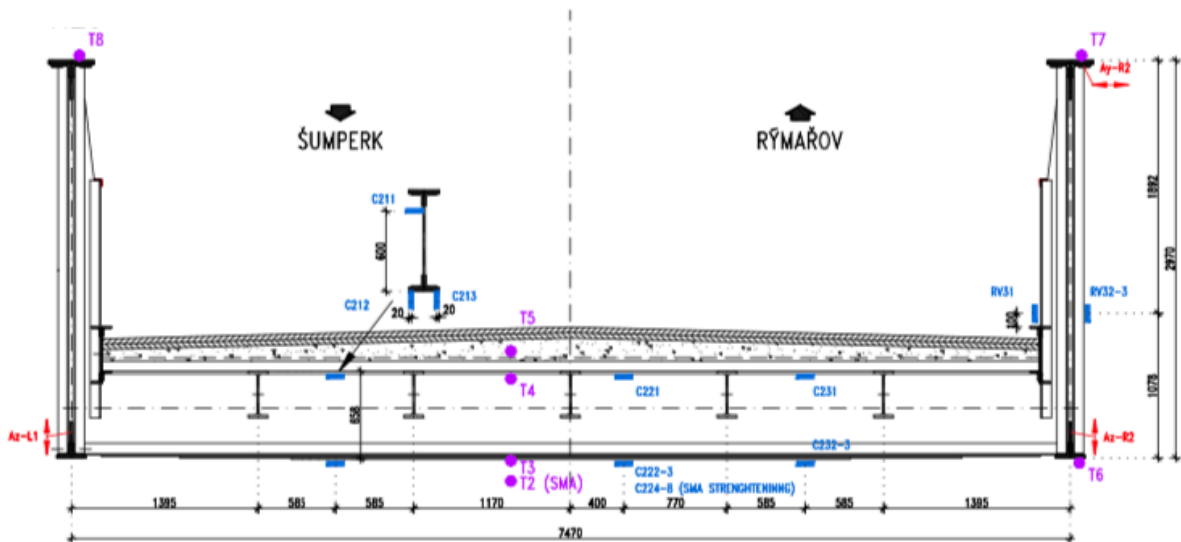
Monitoring Plan: Section 2-2 (Not to Scale).
